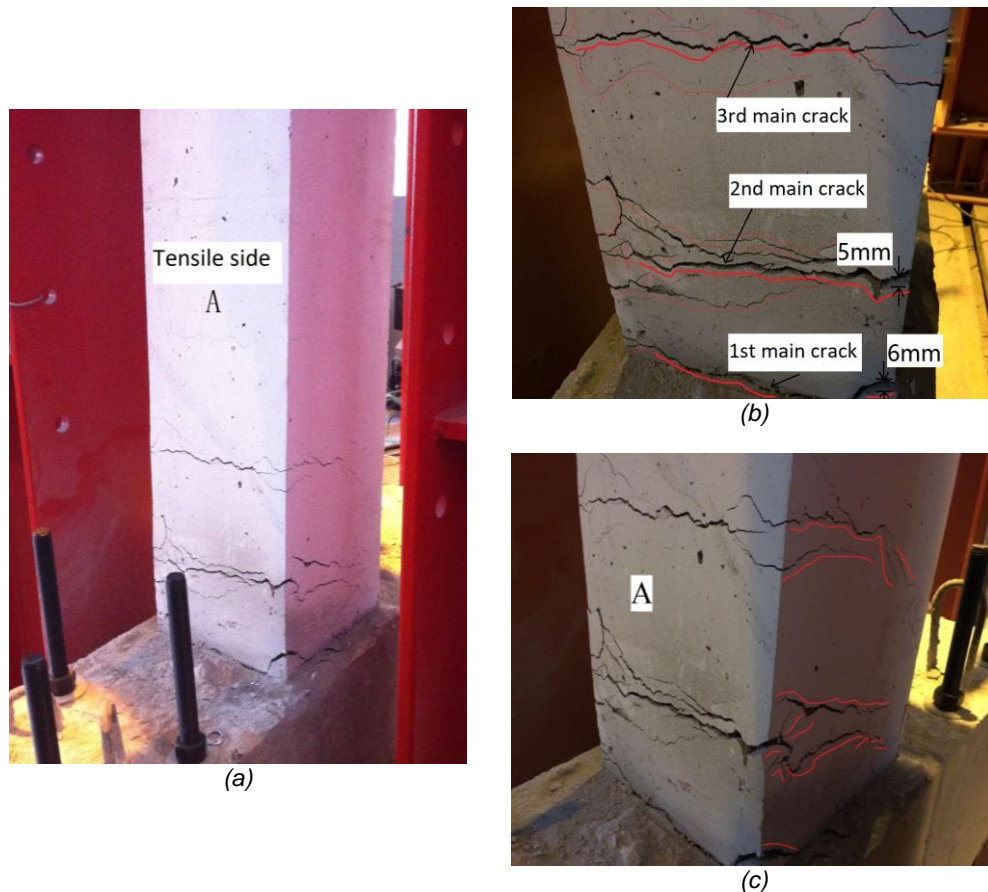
Photos of the specimen after testing-View of tensile side
